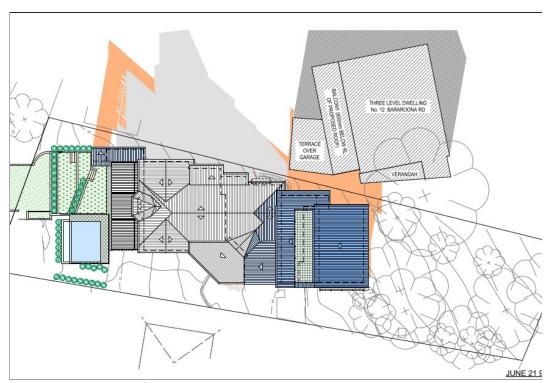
June 21 9am Shadow Diagram (orange highlighting new shadows).
